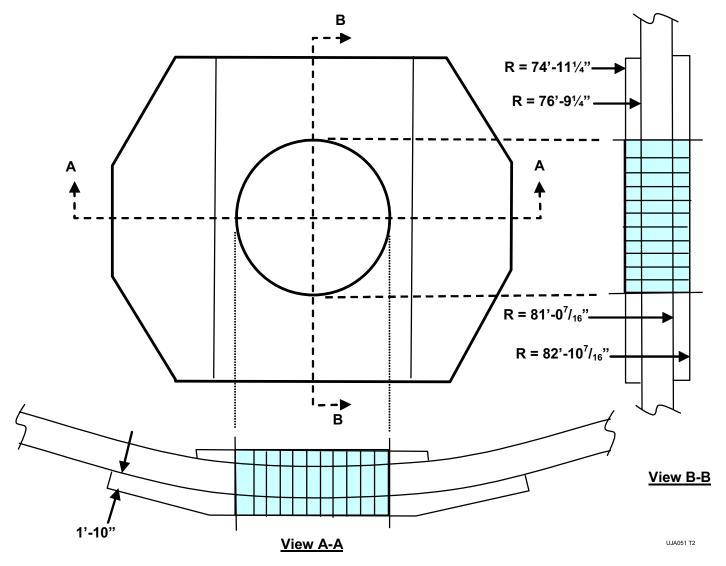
E.1-10—Elevation View of Equipment Hatch Area Showing Cuts
